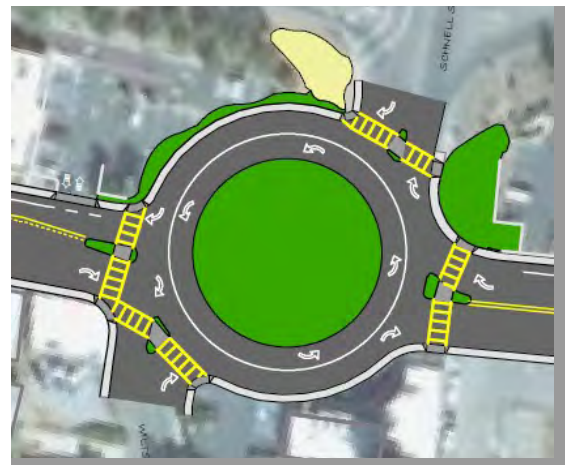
Conceptual Schnell School Road/Broadway roundabout design
